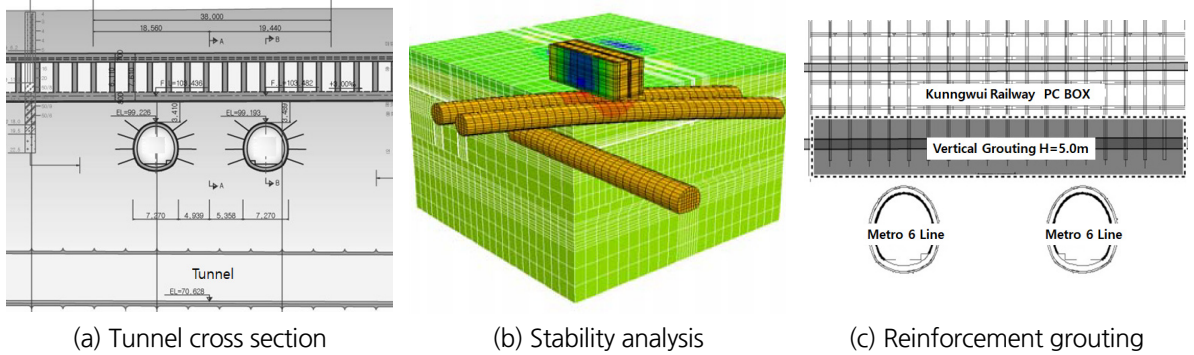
Urban tunnelling under box structure in Kyungwui railway (Lee, 2004)
